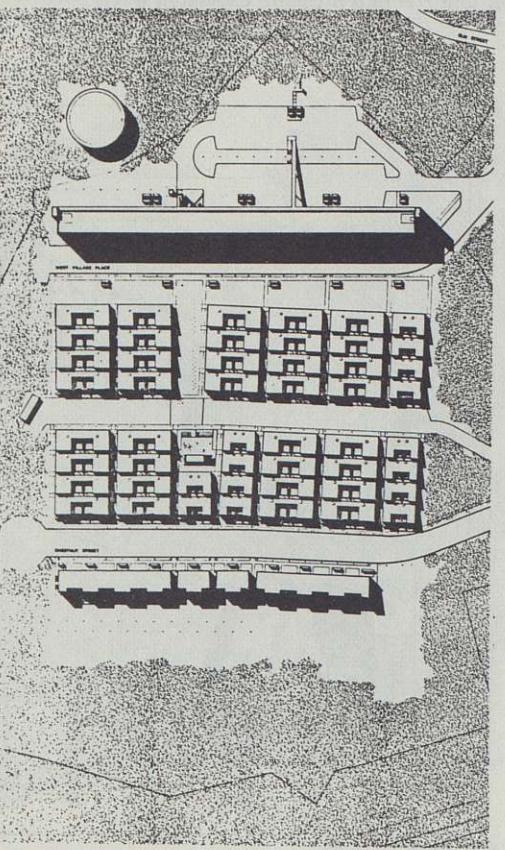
West Hill Village (Ithaca, NY): Site Plan.
